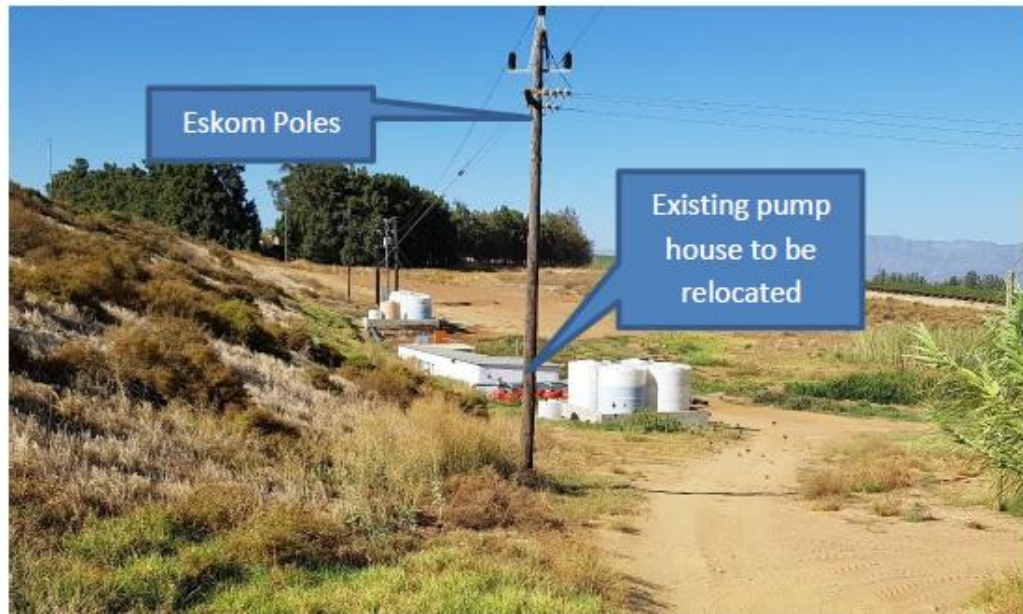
Existing Eskom Poles and existing pumphouse to be relocated, Engineers Technical Report, 2019
